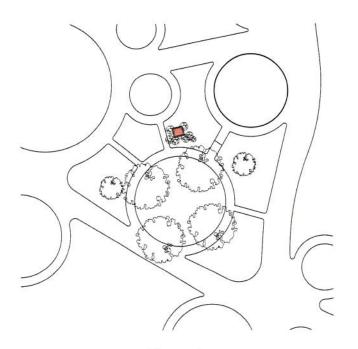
Site Plan, Woodlawn Cemetery, Buhler Mausoleum
